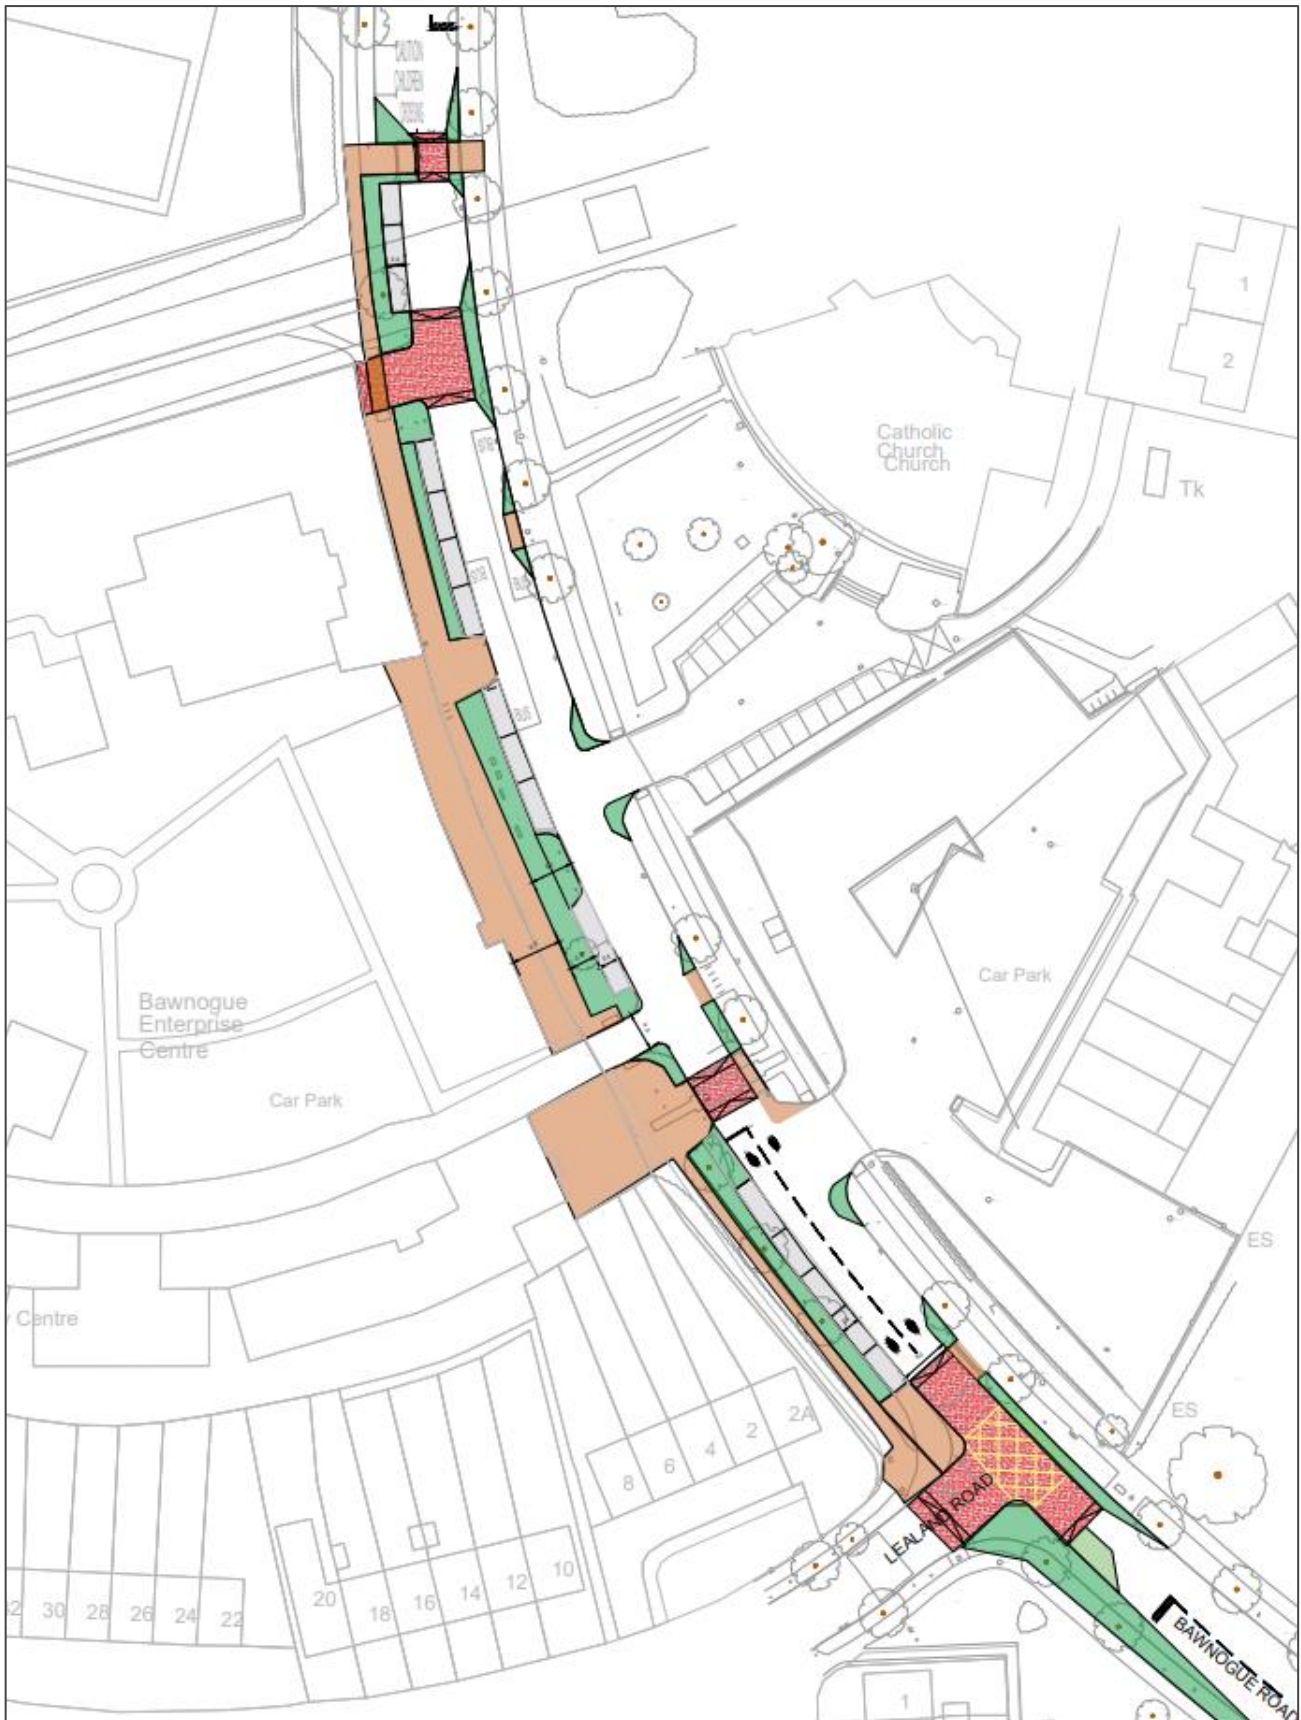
Retention of on-street parking. Reduction of carriageway width to 6m. Removal of centre-line road markings to help create 'quiet zone' outside ACE Enterprise Park and Community Centre buildings.
